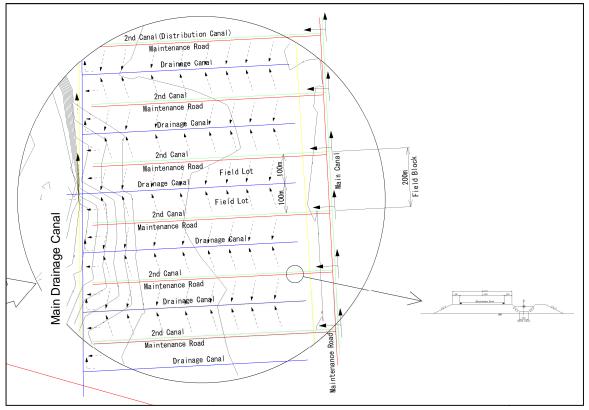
Secondary Canal and Drainage in Command Area
